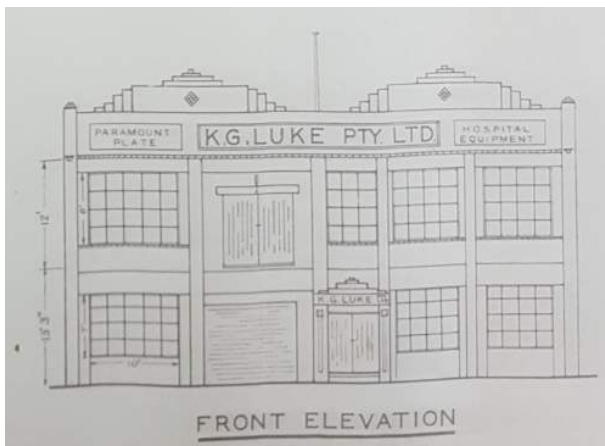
1933 drawings – proposed design of the Queens Parade facade to the double-gabled building (PROV, 1933).
